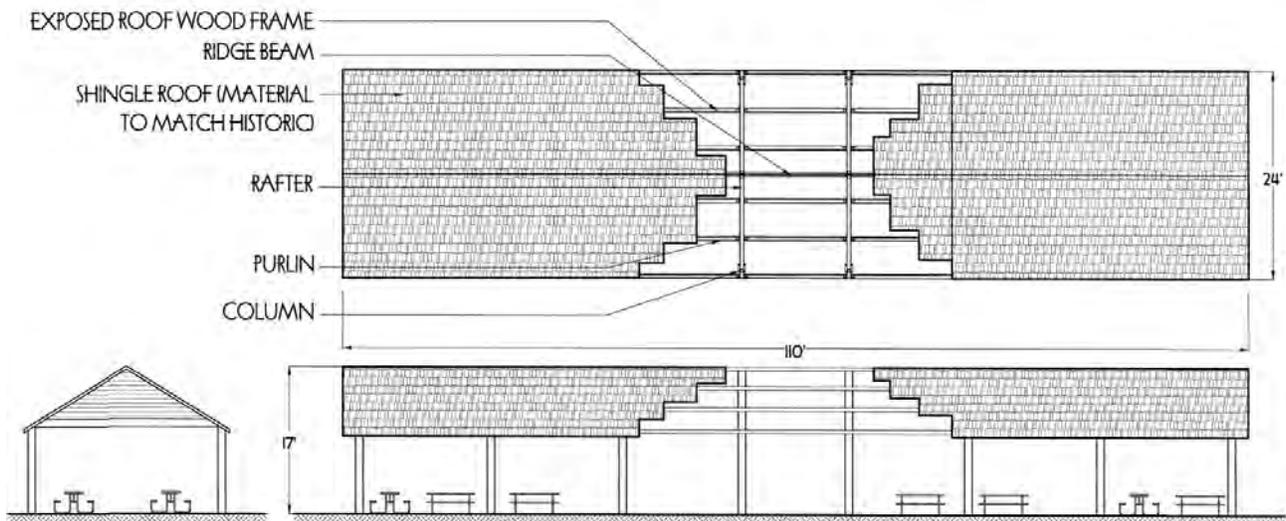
Plan and section of proposed alternate picnic pavilion.
